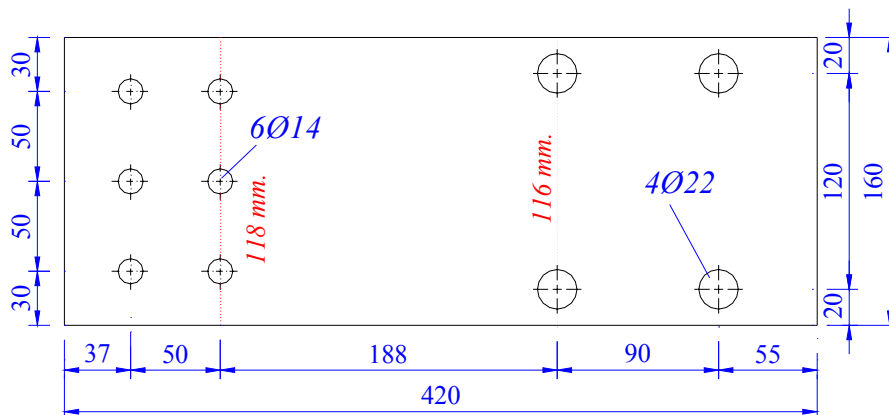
Joint type B1 detail of anchorage positions to steel base plate.
